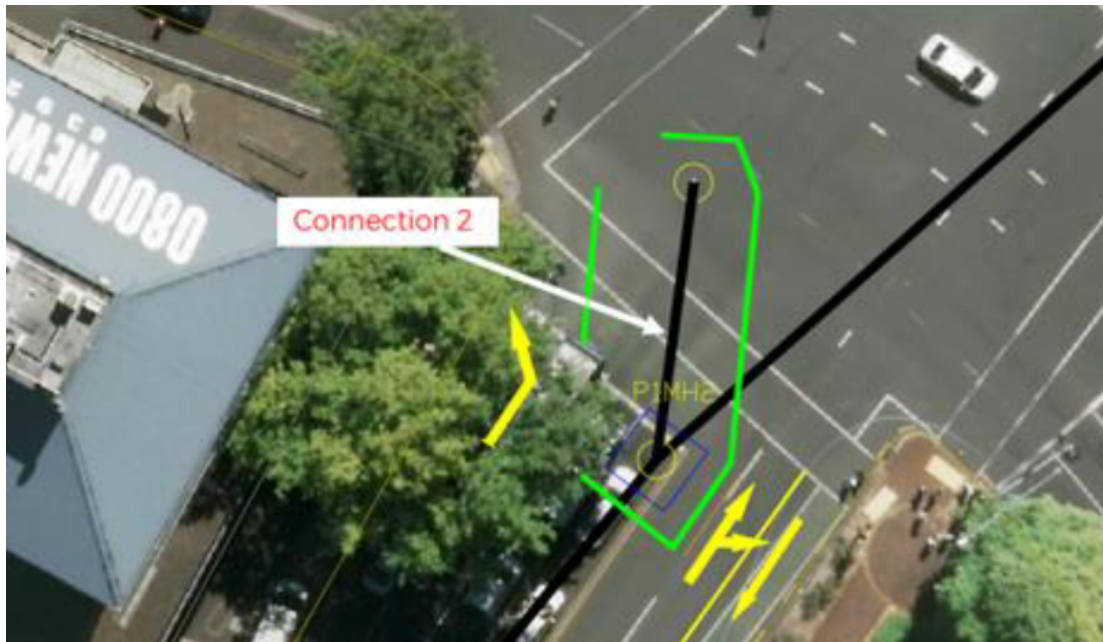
Plan view of short-term TM for an EOP connection using opencut method
